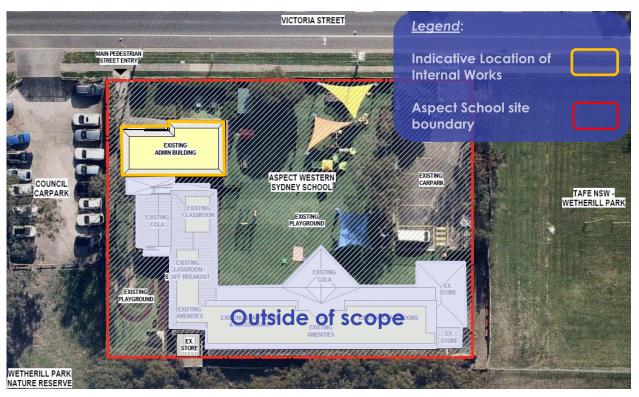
Extract of Site plan with proposed works marked in orange (source: DesignInc)
